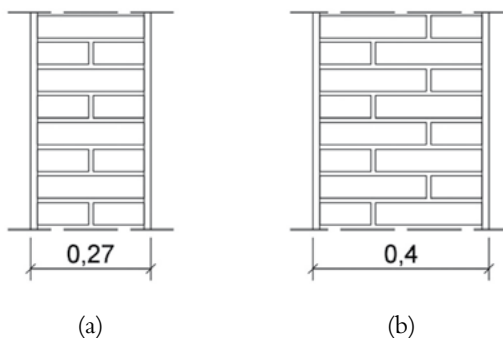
“Un pie” (a) and “un pie y medio” (b) masonry wall section.
